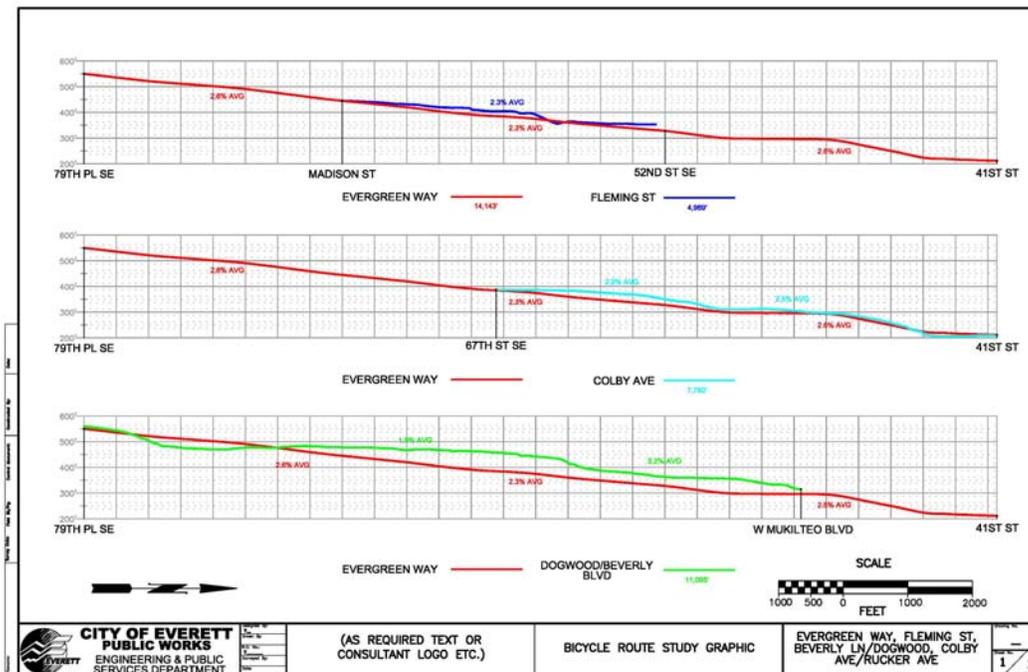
Elevation profile of Evergreen Way and parallel routes
